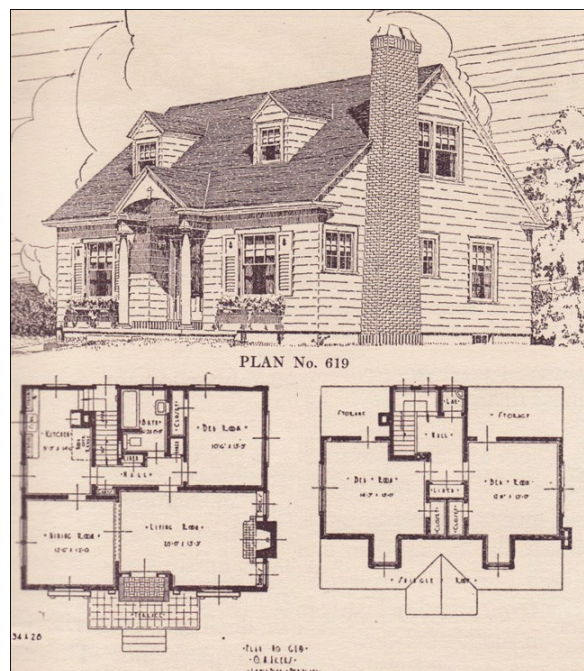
Colonial Revival Cape Cod House Plans. *The Portland Telegram Plan Book Oregon No 619, 1940.
